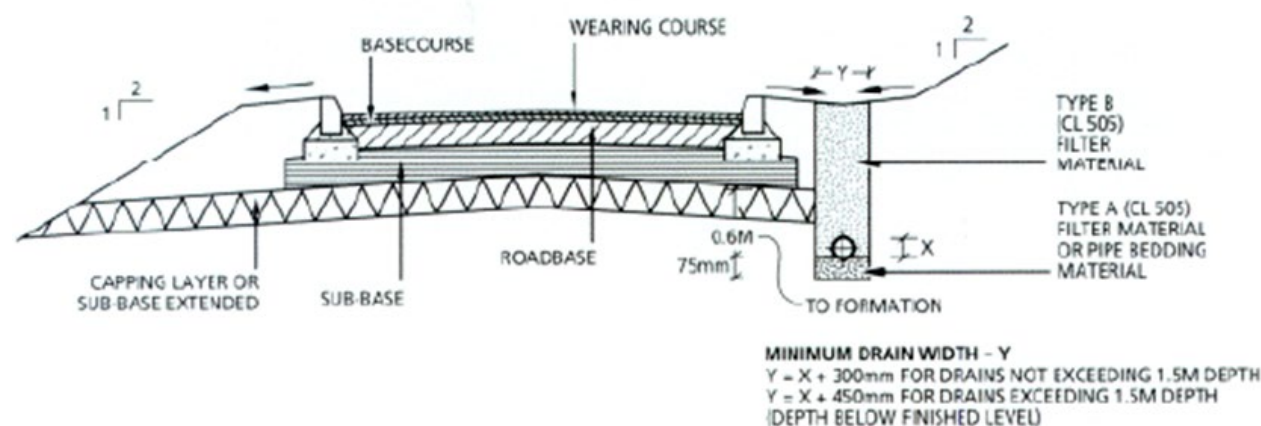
Section Through Road Indicating Sub Grade Drainage
